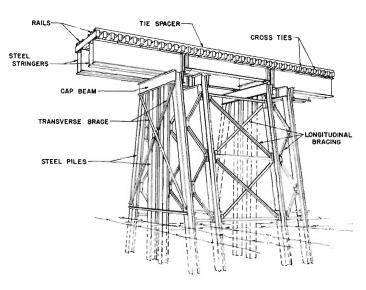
Railway bridge, steel stringers on braced steel pile piers.
